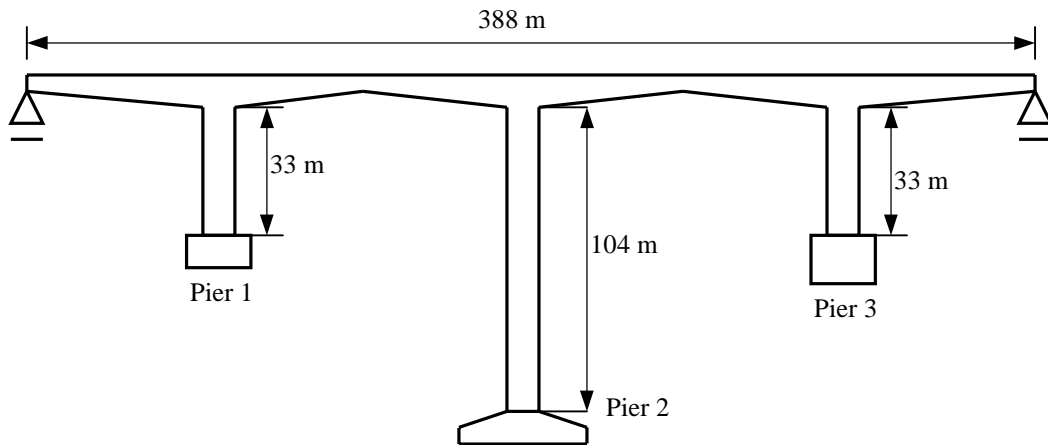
Four-span Continuous PC Rigid-frame Box Girder Bridge Model
